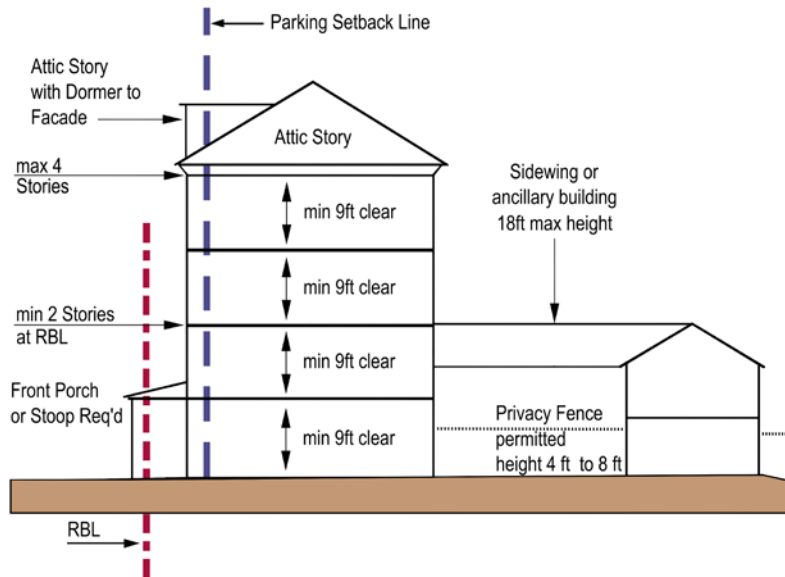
Townhouse/Small Apartment Height Standards
